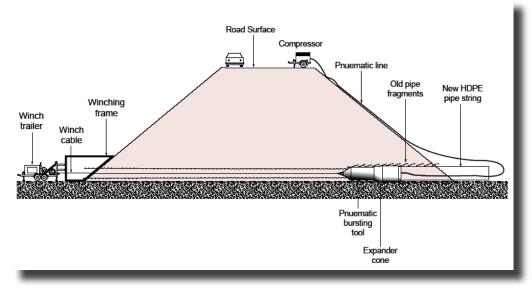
Sketch of pipe bursting, with a new pipe being pulled through an old pipe, thus avoiding trench excavation and traffic delays.
